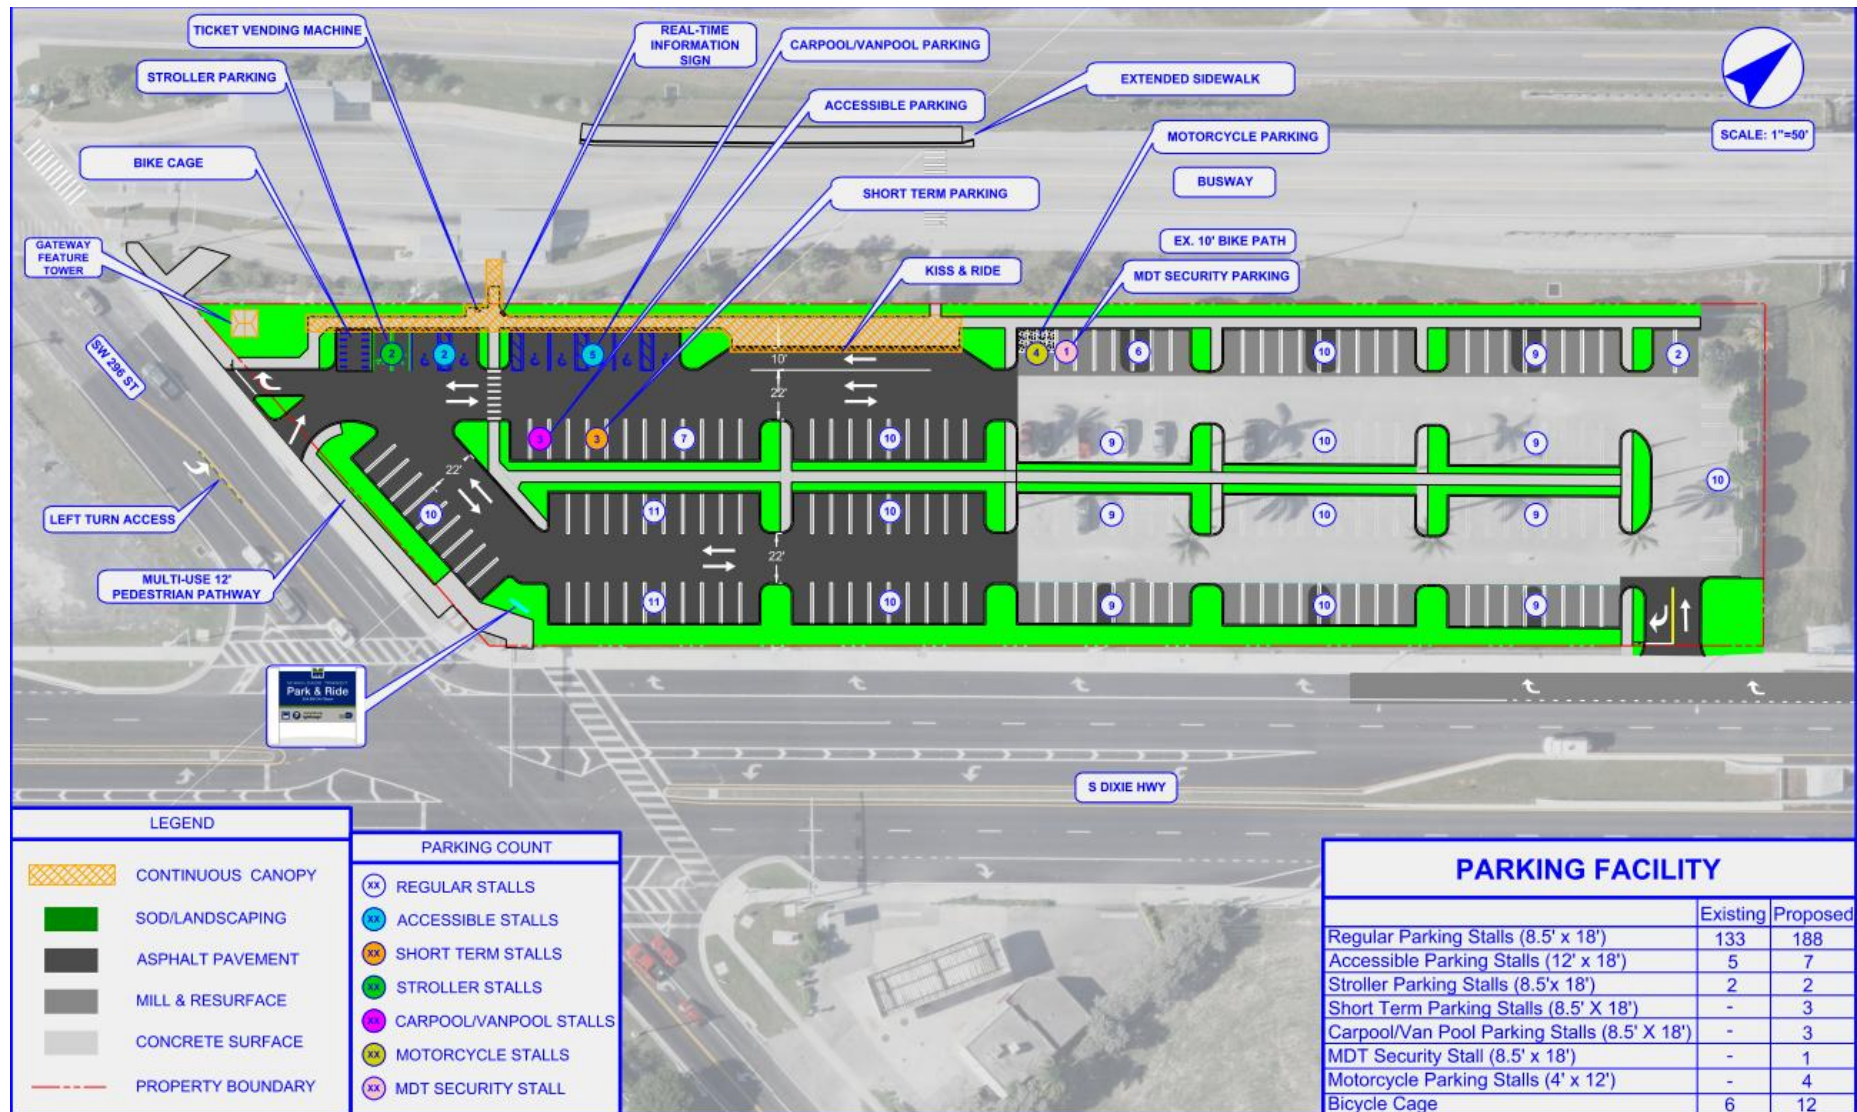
Busway Park-and-Ride at SW 296th Street Proposed Improvement Plan
